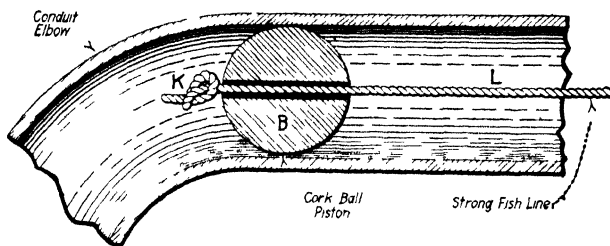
Cork-ball piston on end of fish line for pneumatic fishing
